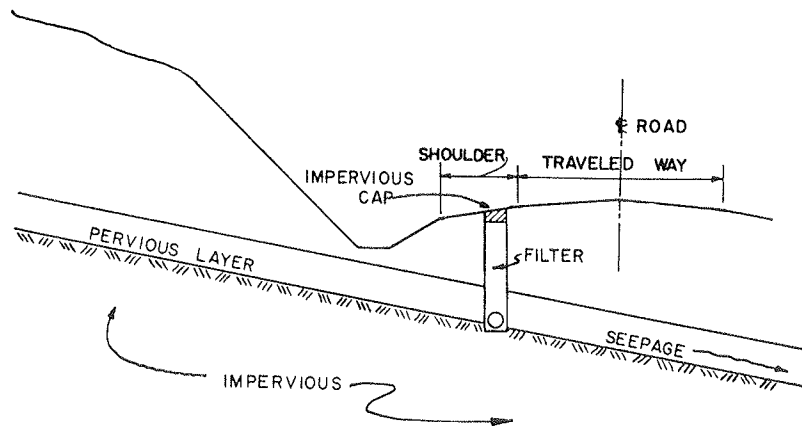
This subdrain intercepts water flowing under a road to keep the base dry and stable.
